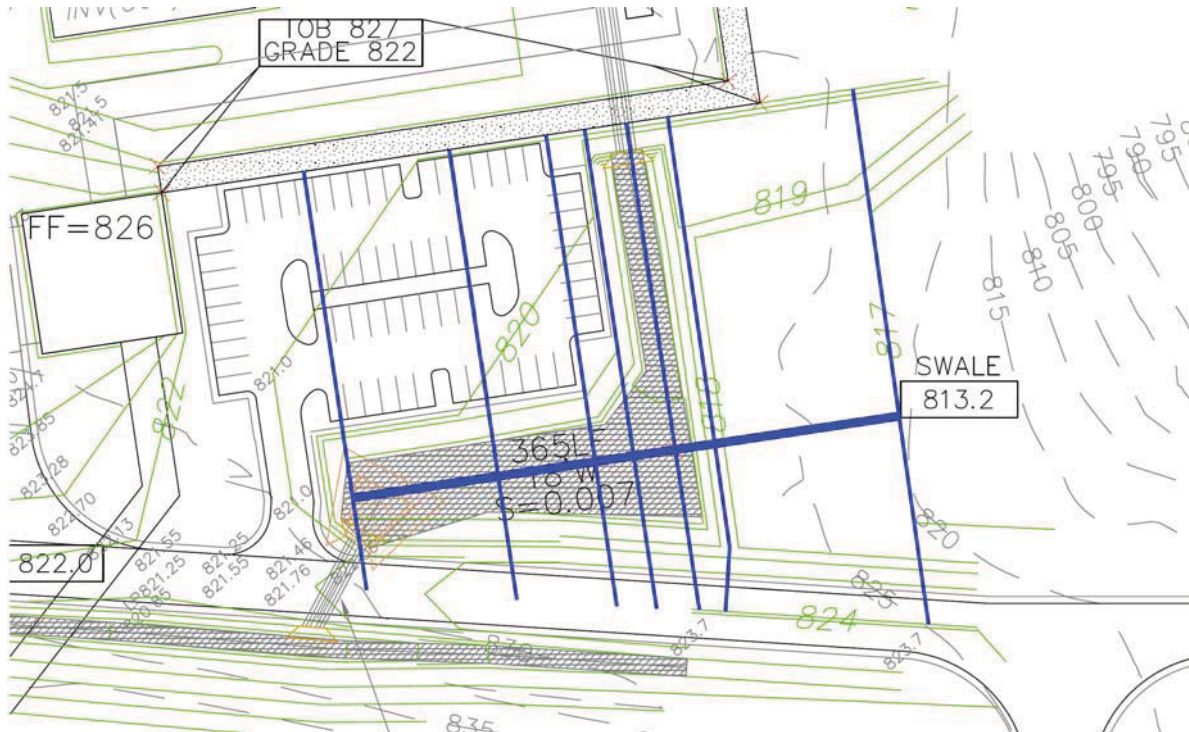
Off-site Channel Cross Sections (Source: URS 2011d)
